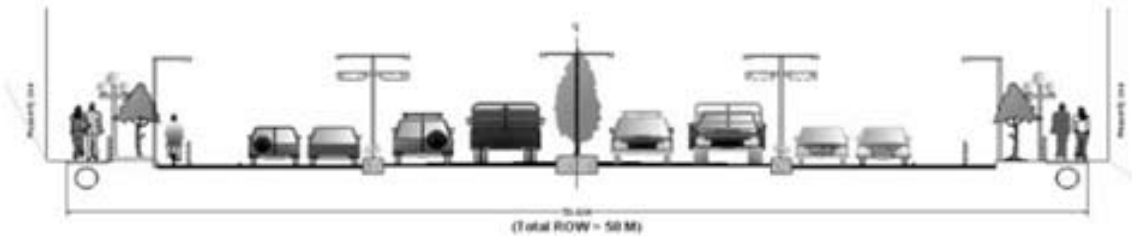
Typical road section with detailing of the proposed Outer Ring Road project [ORR] [Source: DUDBC, 2008]
